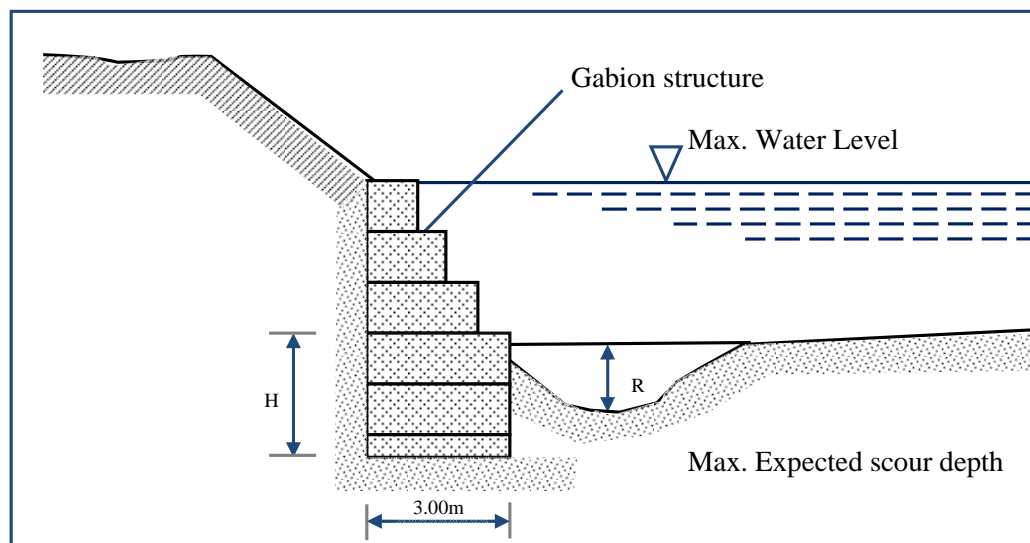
Gabion Retaining Wall with Deep Foundation
